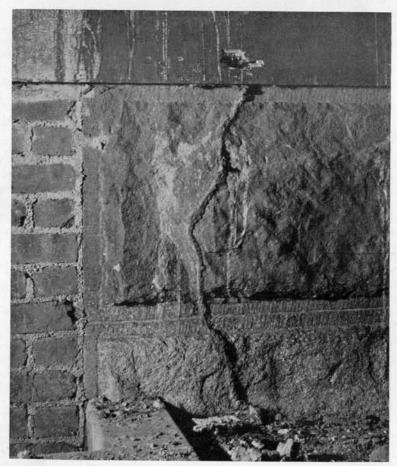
Termites constructed this shelter tube from wood to the ground in a partly excavated area, formerly an exterior wall.
